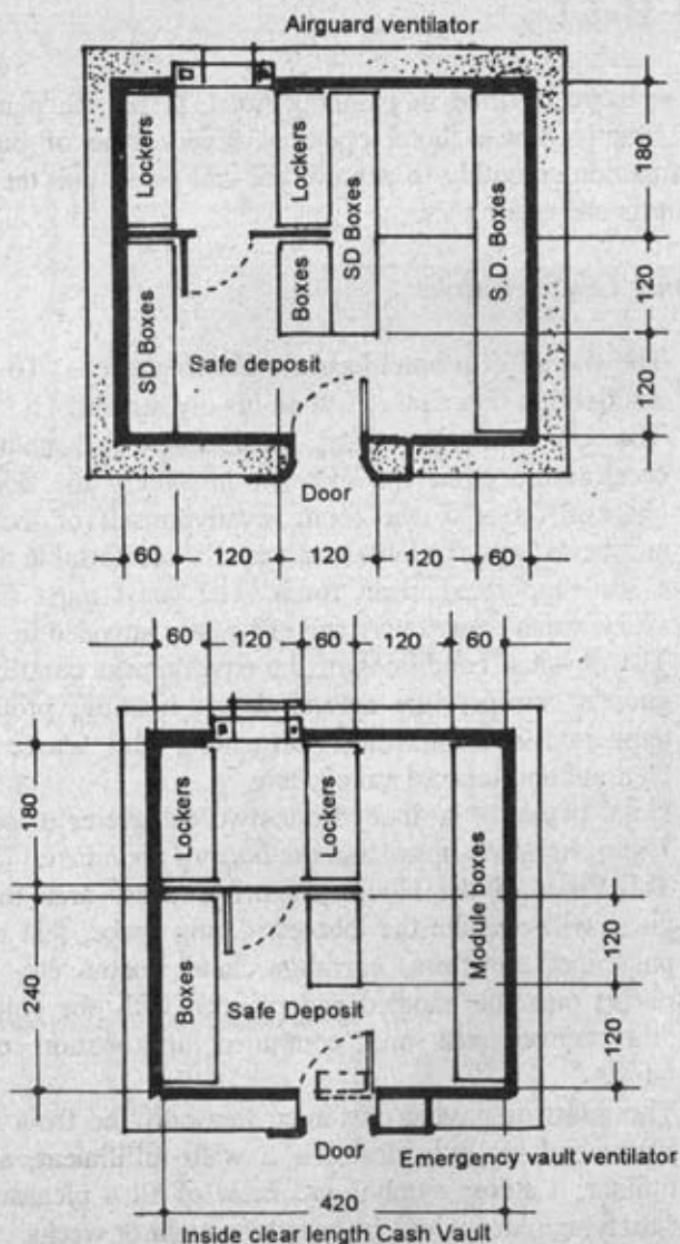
PLAN OF DOUBLE AISLE VAULT
